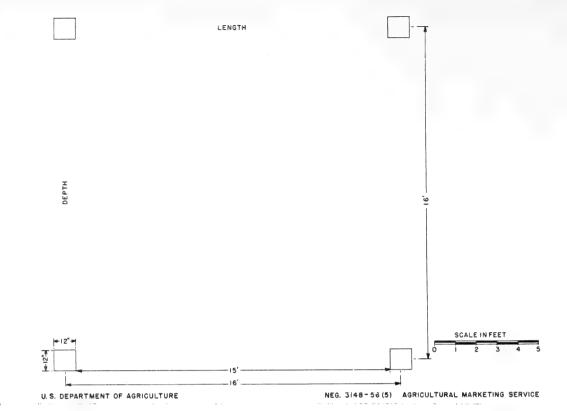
Dimensions of floor area of storage bay in a typical cold storage room for apples.
